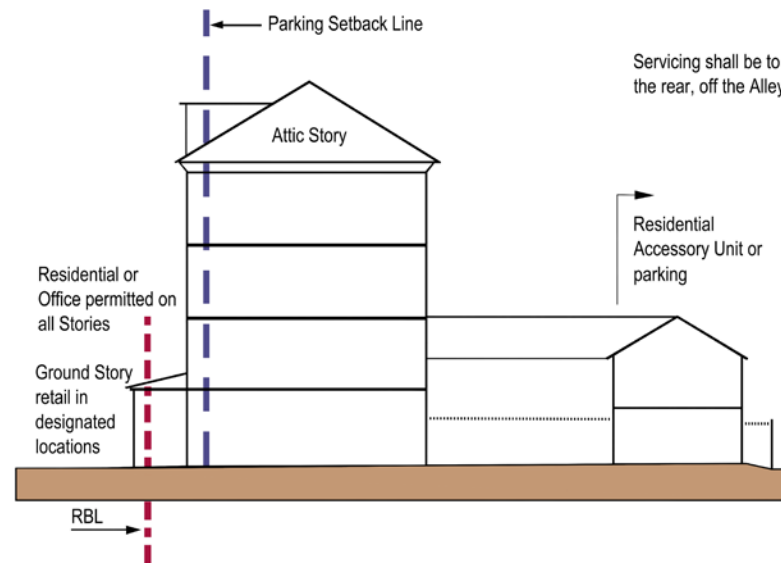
Townhouse/Small Apartment Use Standards
